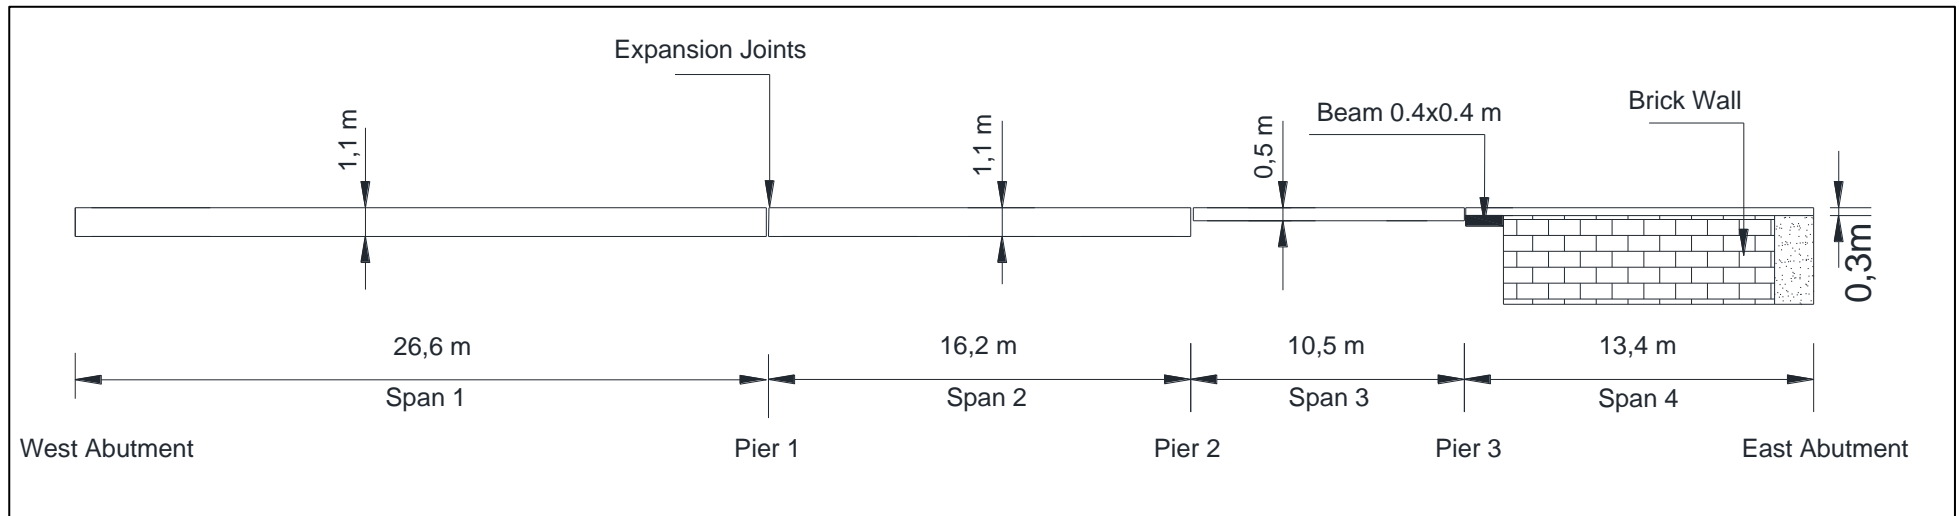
Pentagon Road Bridge Decks Cross Section View
